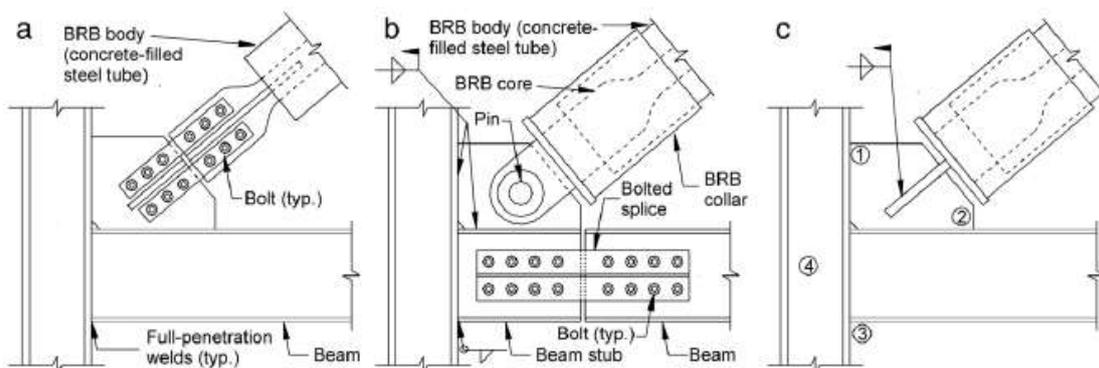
a) continuous beam bolted brace b) split beam pinned brace c) continuous beam welded brace [19]
